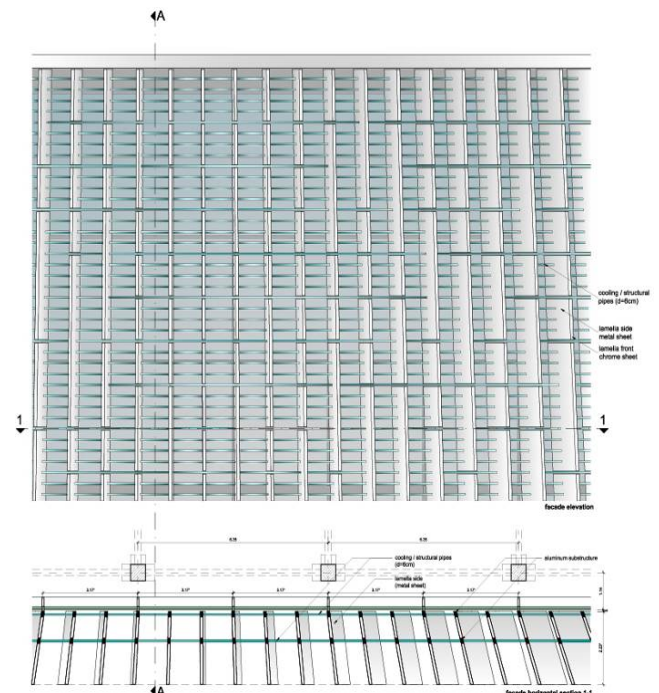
Elevation and plan drawings of Façade type 1 show cooling pipes woven between the vertical lamellas providing additional structural support
